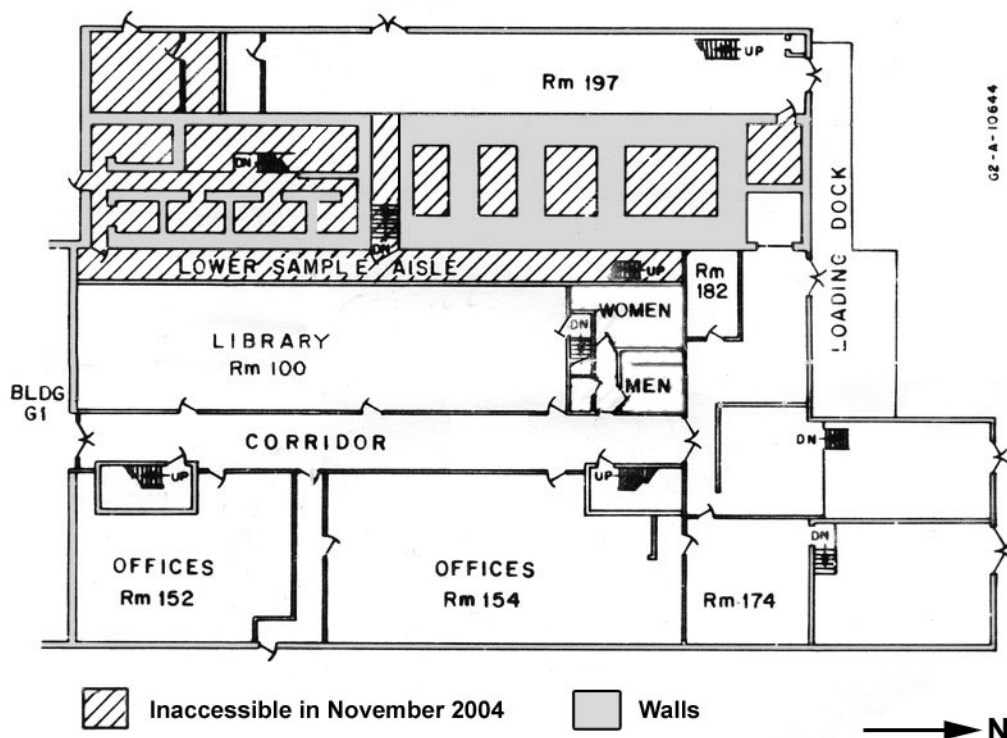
Building G2, First Floor, 337-Foot Level, (modified from Drawing No. G2-A-10644, February 17, 1984; approximates 2004 configuration)
